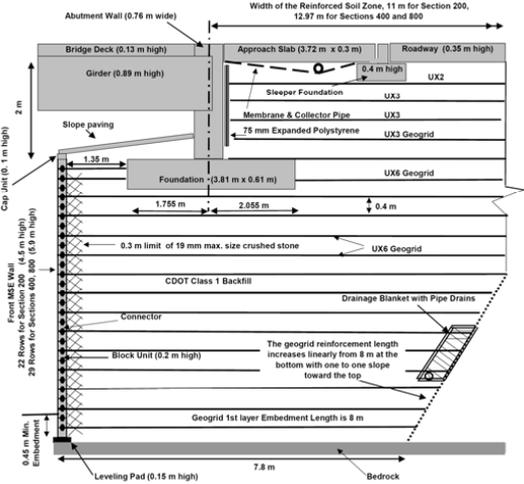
View of the instrumented Founders/Meadow segmental bridge abutment near Denver, USA (Abu-Hejleh et al., 2000)
